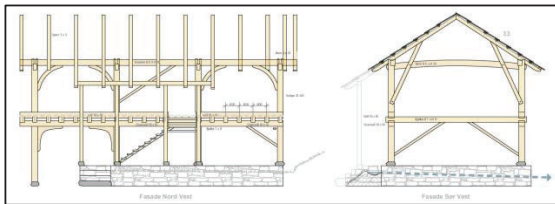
The grindbygg, as an open building without insulation nor wall-cladding.
